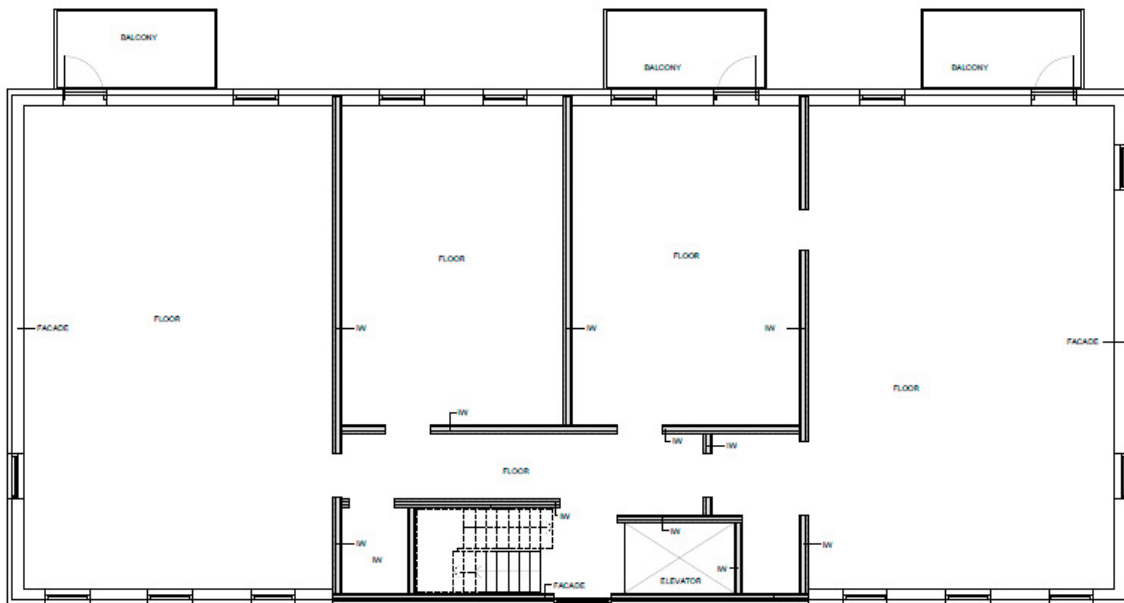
A floor plan for the reference building. IW stands for Inner Wall, which, along with the floor slabs, are the main components affected by the sound classification.
